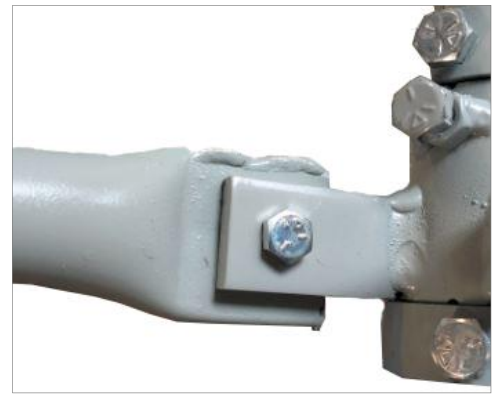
BRACE ROD CONNECTED TO SPIDER
